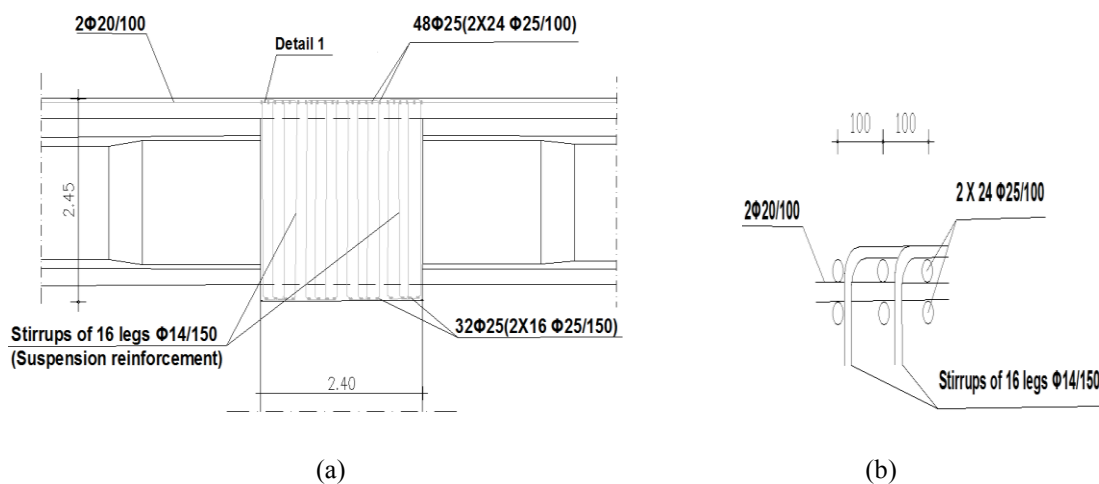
(a) Deck longitudinal section A-A. (b) Reinforcement detail at the upper flange of the pier head.
